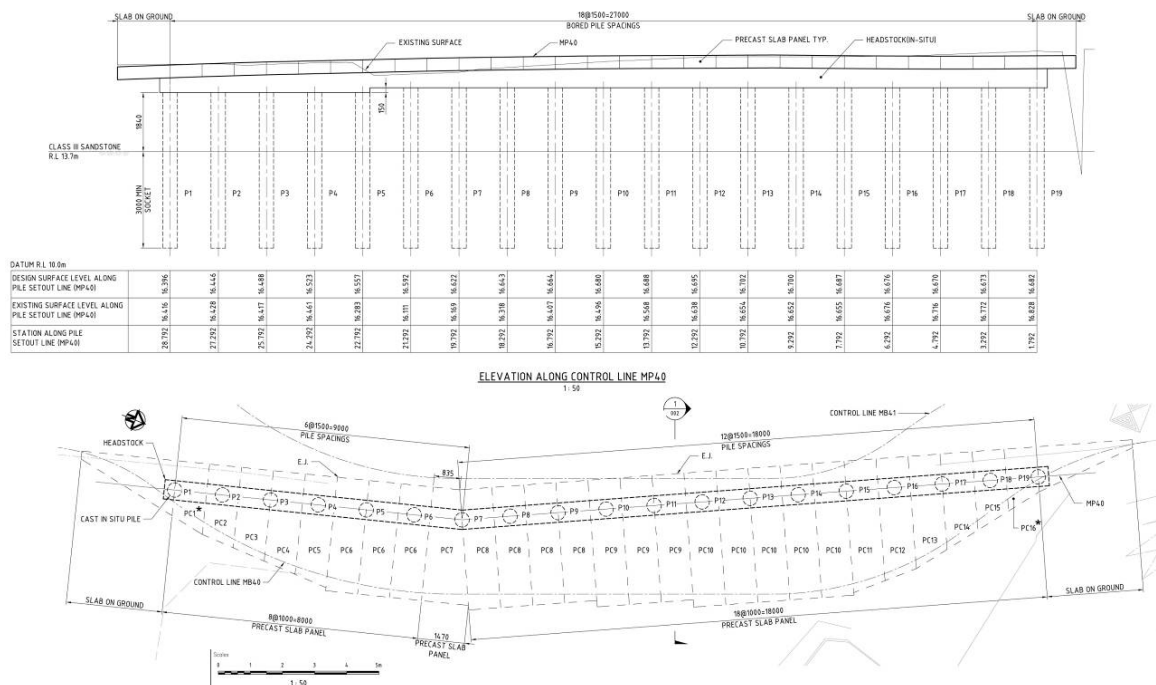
Plan and section of the proposed development. (Bridge to Bay Alliance - Victoria Road Upgrade, file name: HYD-DRG-BS-whitebay_1.dwg)
